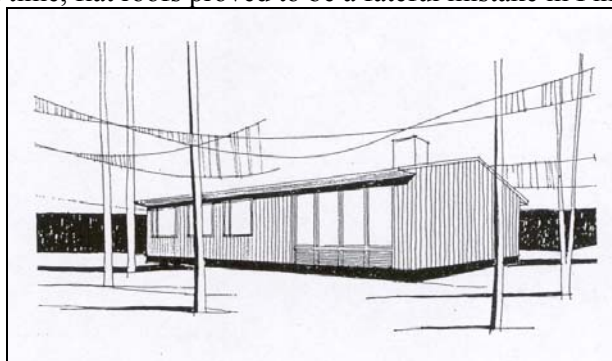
Wooden houses from the 1960s were built into one storey and cellars were no longer built. The houses were made low and the roofs gently sloped.
